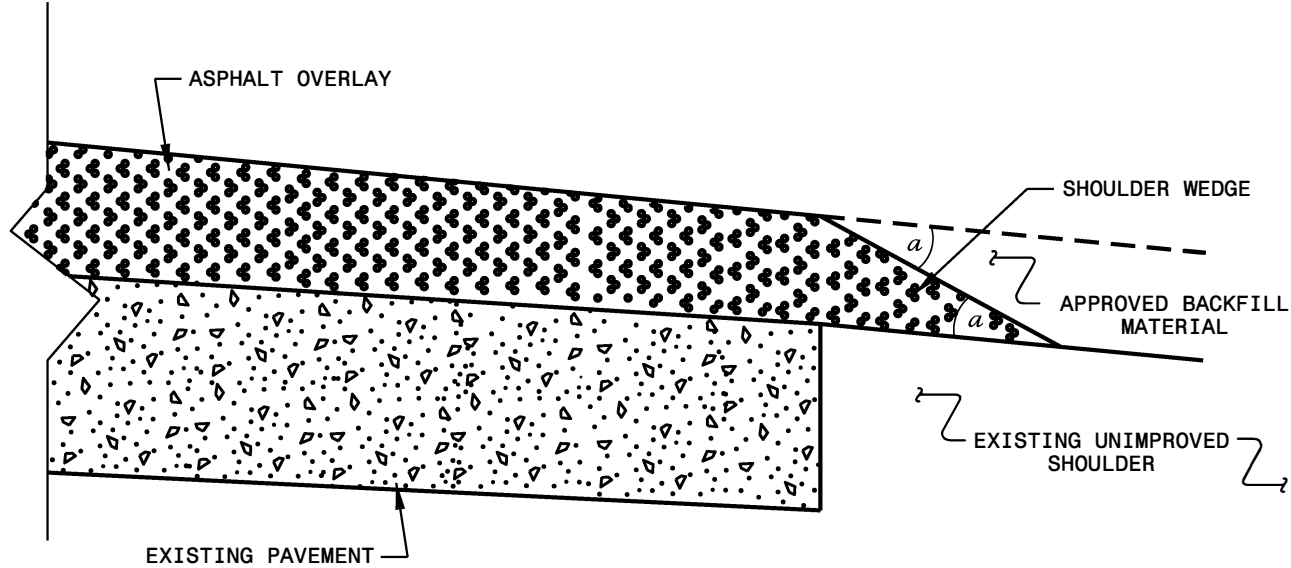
DETAIL TO TIE INTO EXIST PAVEMENT
